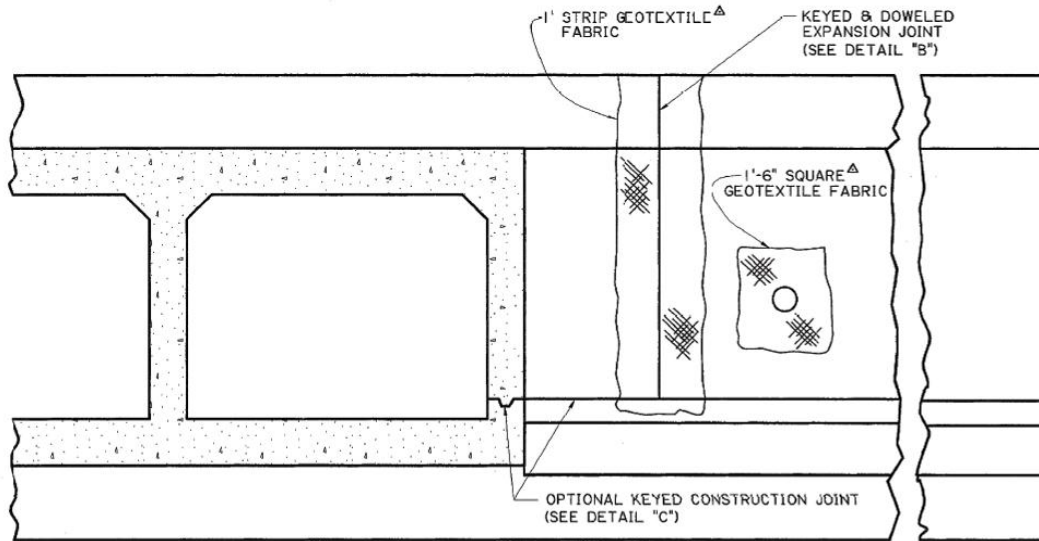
La DOTD Box Culvert Section Showing the Rear Side of a Wingwall and Expansion and Construction Joint Locations (La DOTD 2008)
